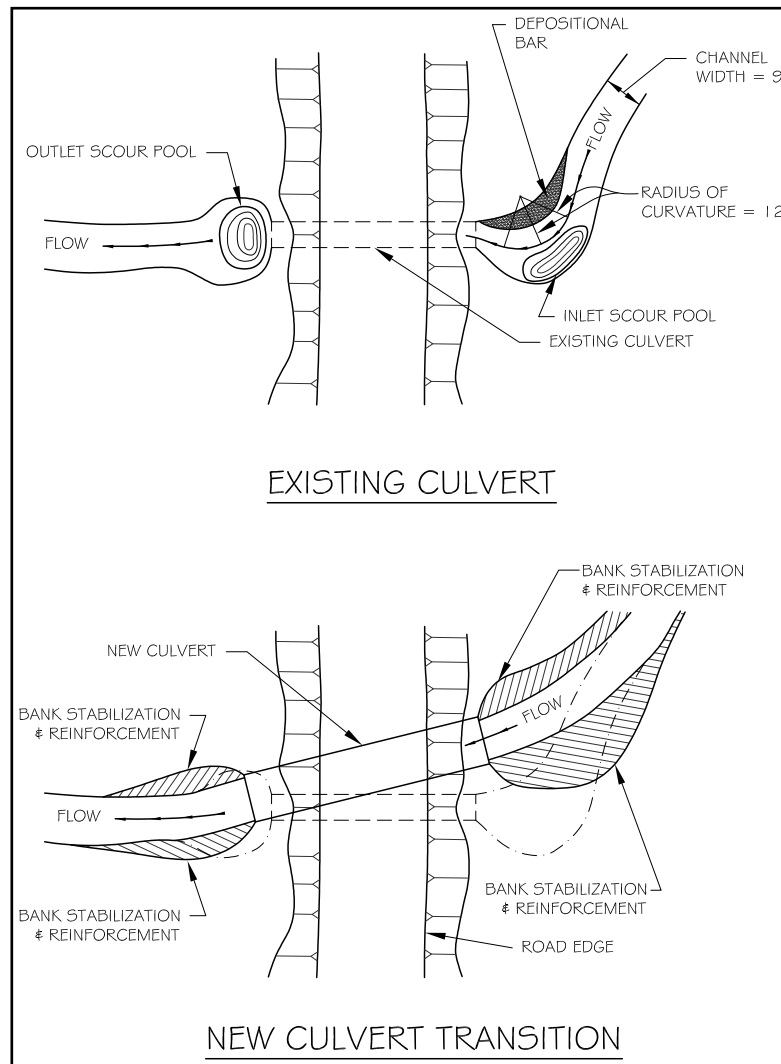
Channel bend upstream of existing culvert has a radius of curvature less than two times bankfull width ($R_{c/w} = 1.3$), with serious potential to obstruct sediment and woody debris. New culvert is realigned, and banklines are excavated and reinforced to create smooth transitions at inlet and outlet.
